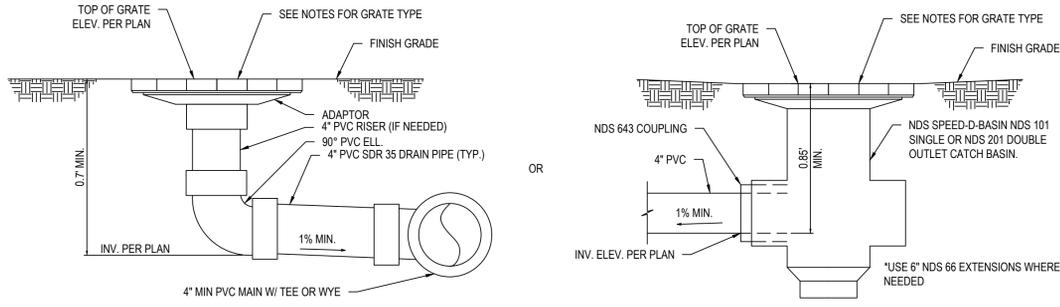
DETAIL BUILDING DRAINAGE 5 NOT TO SCALE
